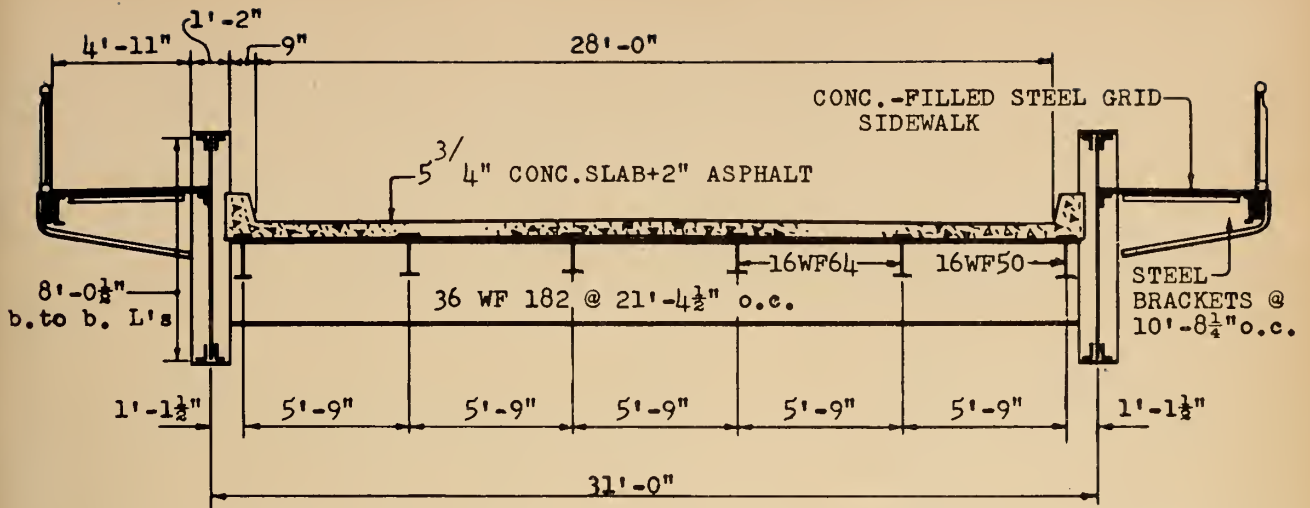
Middle Arm bridge girder swing span. Because openings are infrequent, the swing span has no operator's cabin. All controls are housed in a neat steel panel (not shown here) adjacent to the girder and no higher than the handrail.
